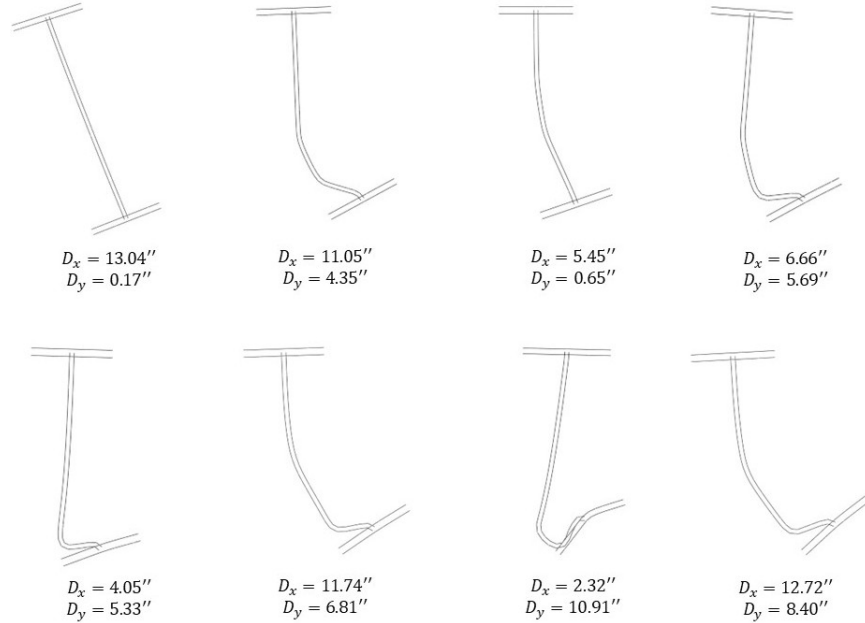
Illustration. Sample of damaged steel girder cross-sections from the constructed dataset.
